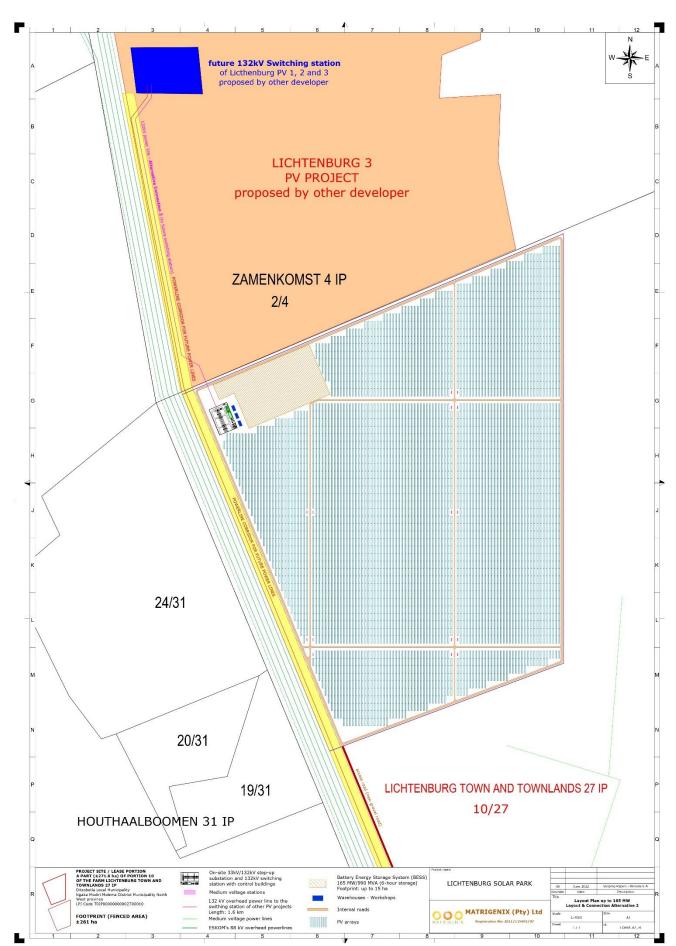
Proposed Draft Layout Plan of the Lichtenburg Solar Park – Alternative 2
